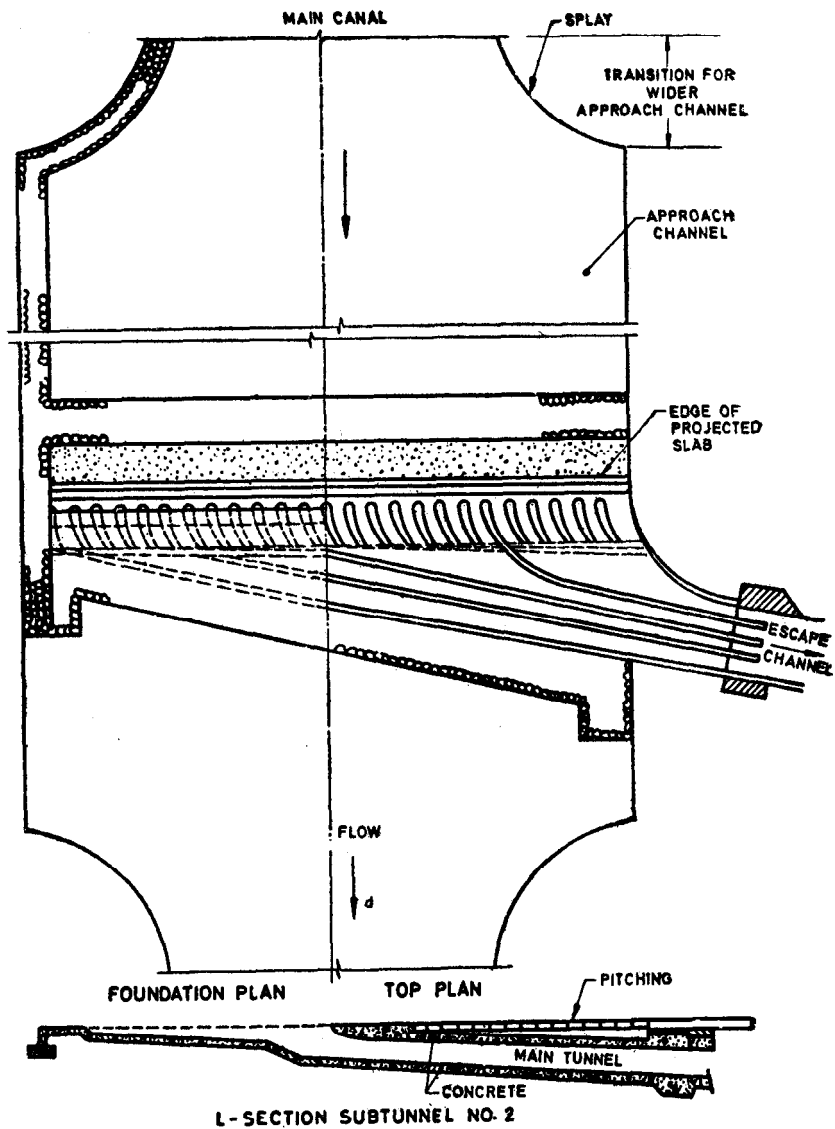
PLAN AND SECTION OF SEDIMENT EJECTOR
